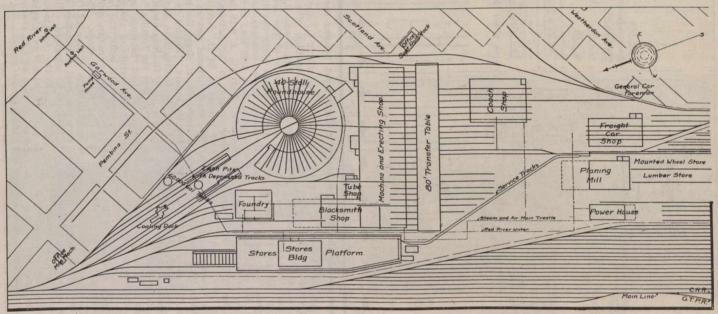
Section 1.- Layout of C.N.R. Fort Rouge Shops-North End.
